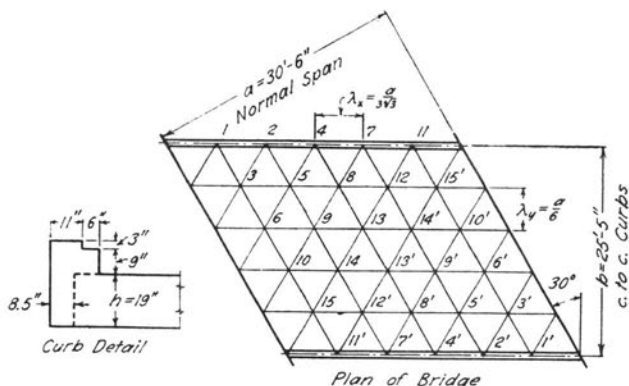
PLAN AND DETAIL OF SKEW SLAB-BRIDGE 30-B
